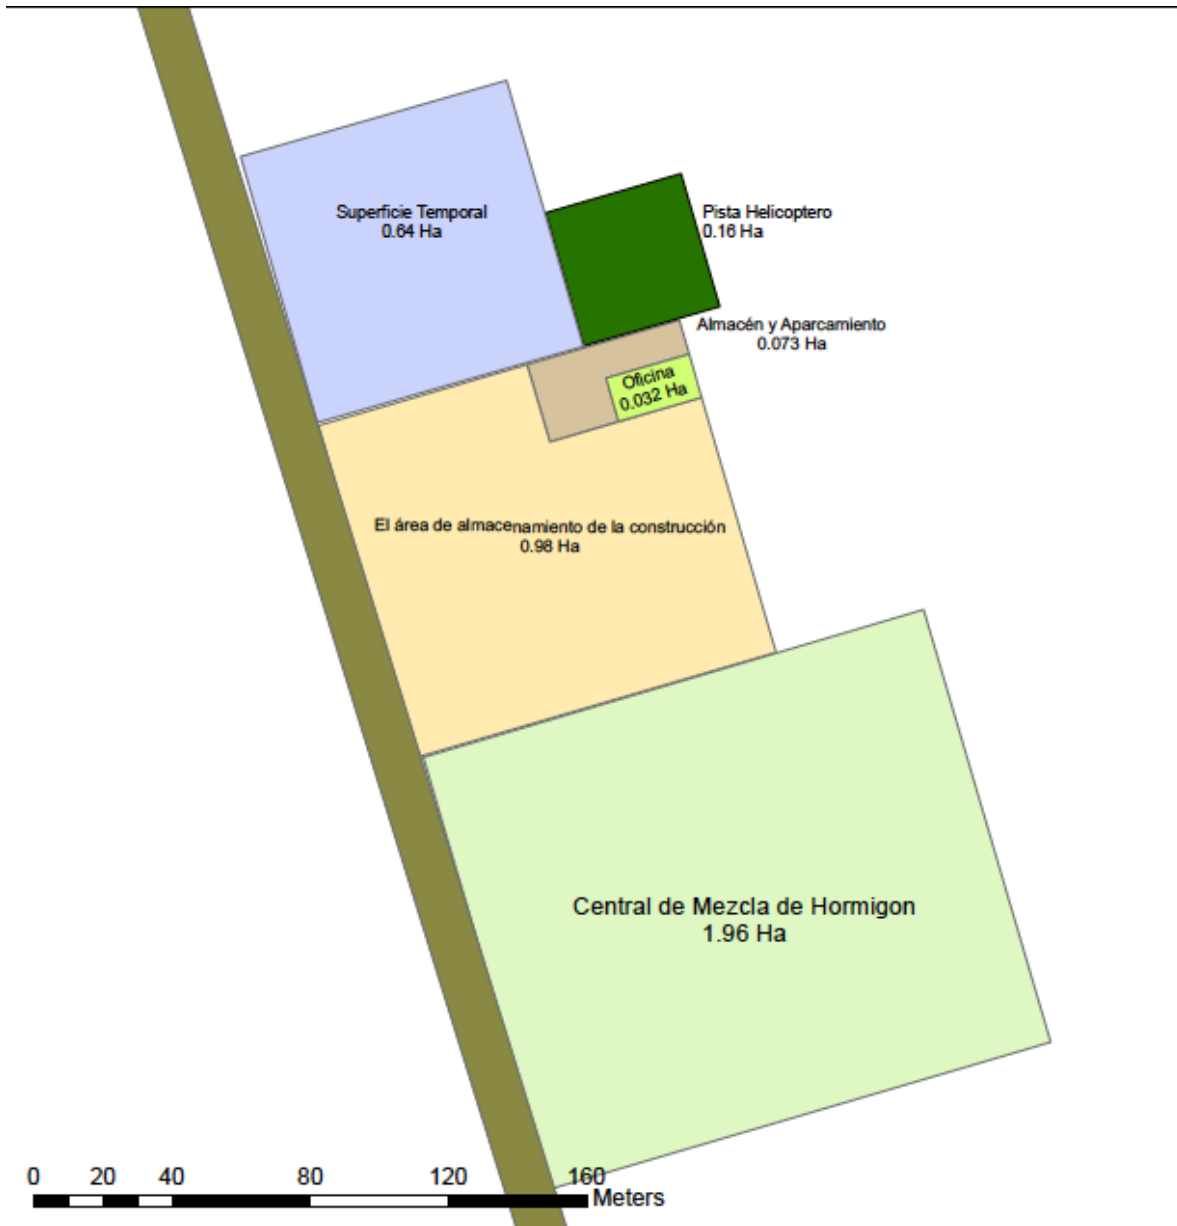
Proposed distribution for operation and maintenance building, helipad, concrete plant and temporary storage area.
